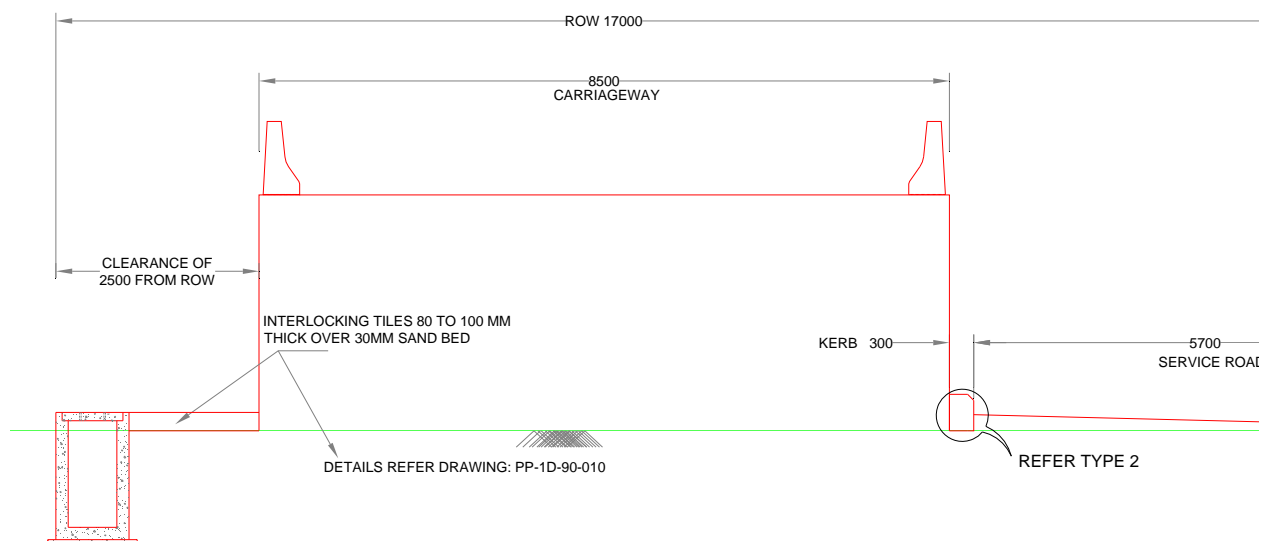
TYPICAL CROSS SECTION- TYPE-10
